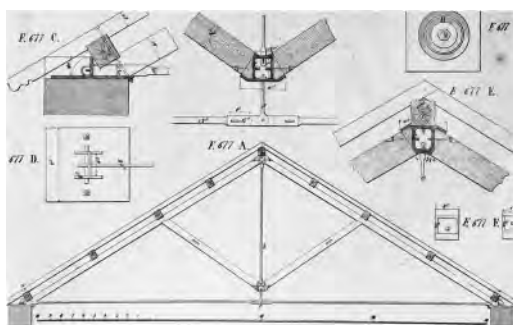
Roof truss with vertical iron tie, horizontal tie-rod and cast-iron shoes (Romberg 1847: plate 69).
